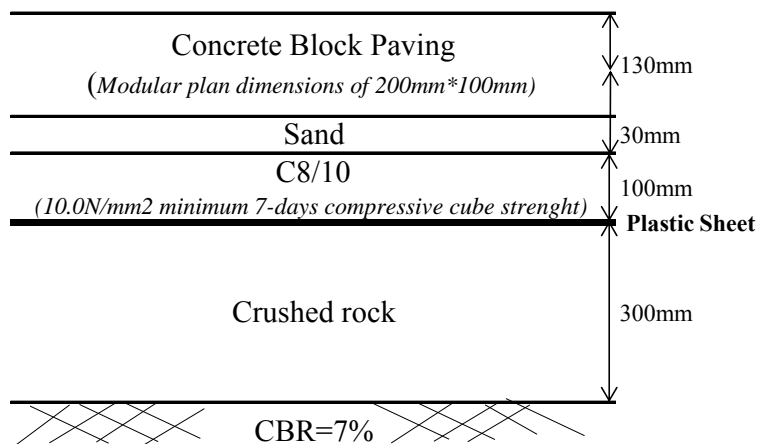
Pavement Structure for Terminal Apron and Road
